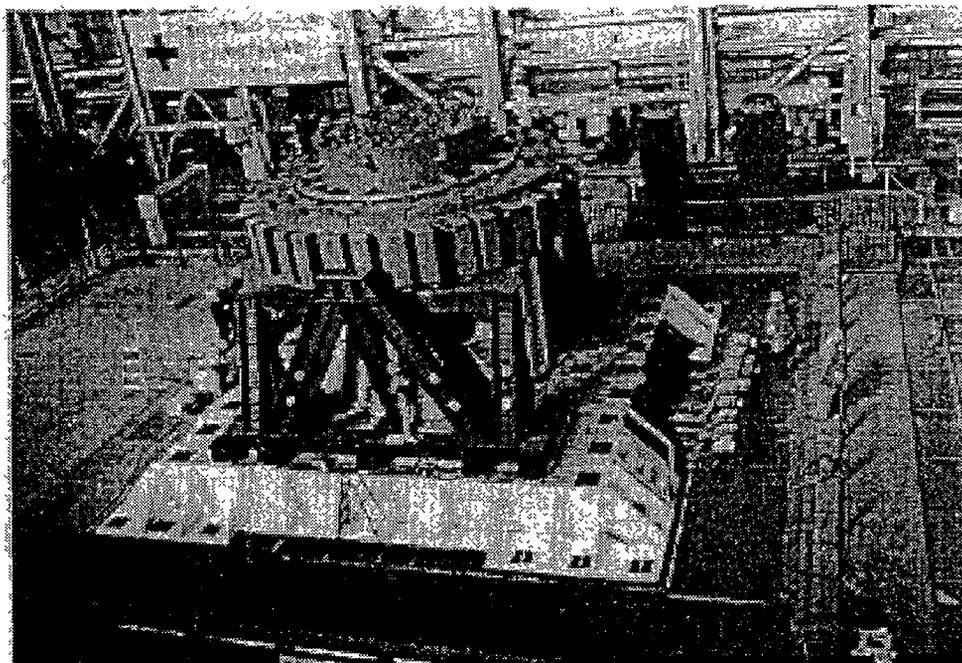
A Bird's-Eye View of the PCCV Test Model Installed on the Shaking Table at Tadotsu Engineering Laboratory, NUPEC.
